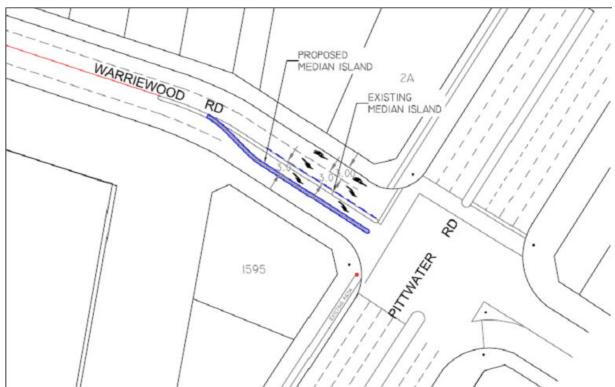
Proposed Concept Design for upgrade of the intersection of Pittwater Road and Warriewood Road is identified within the WVRMP and Section 94 Plan (Source: Pittwater Council, 2012)
